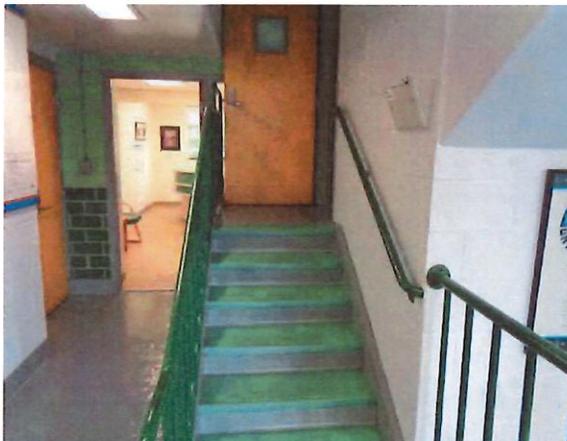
Stairwell leading to 2<sup>nd</sup> Floor
